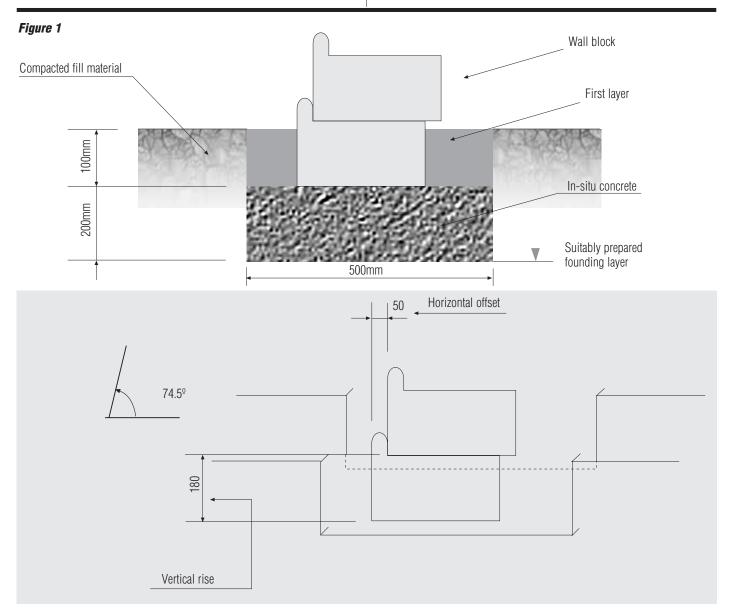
If the foundation is to be stepped, the rise should be multiples of 180mm. The foundation must be stepped back by 50mm.
